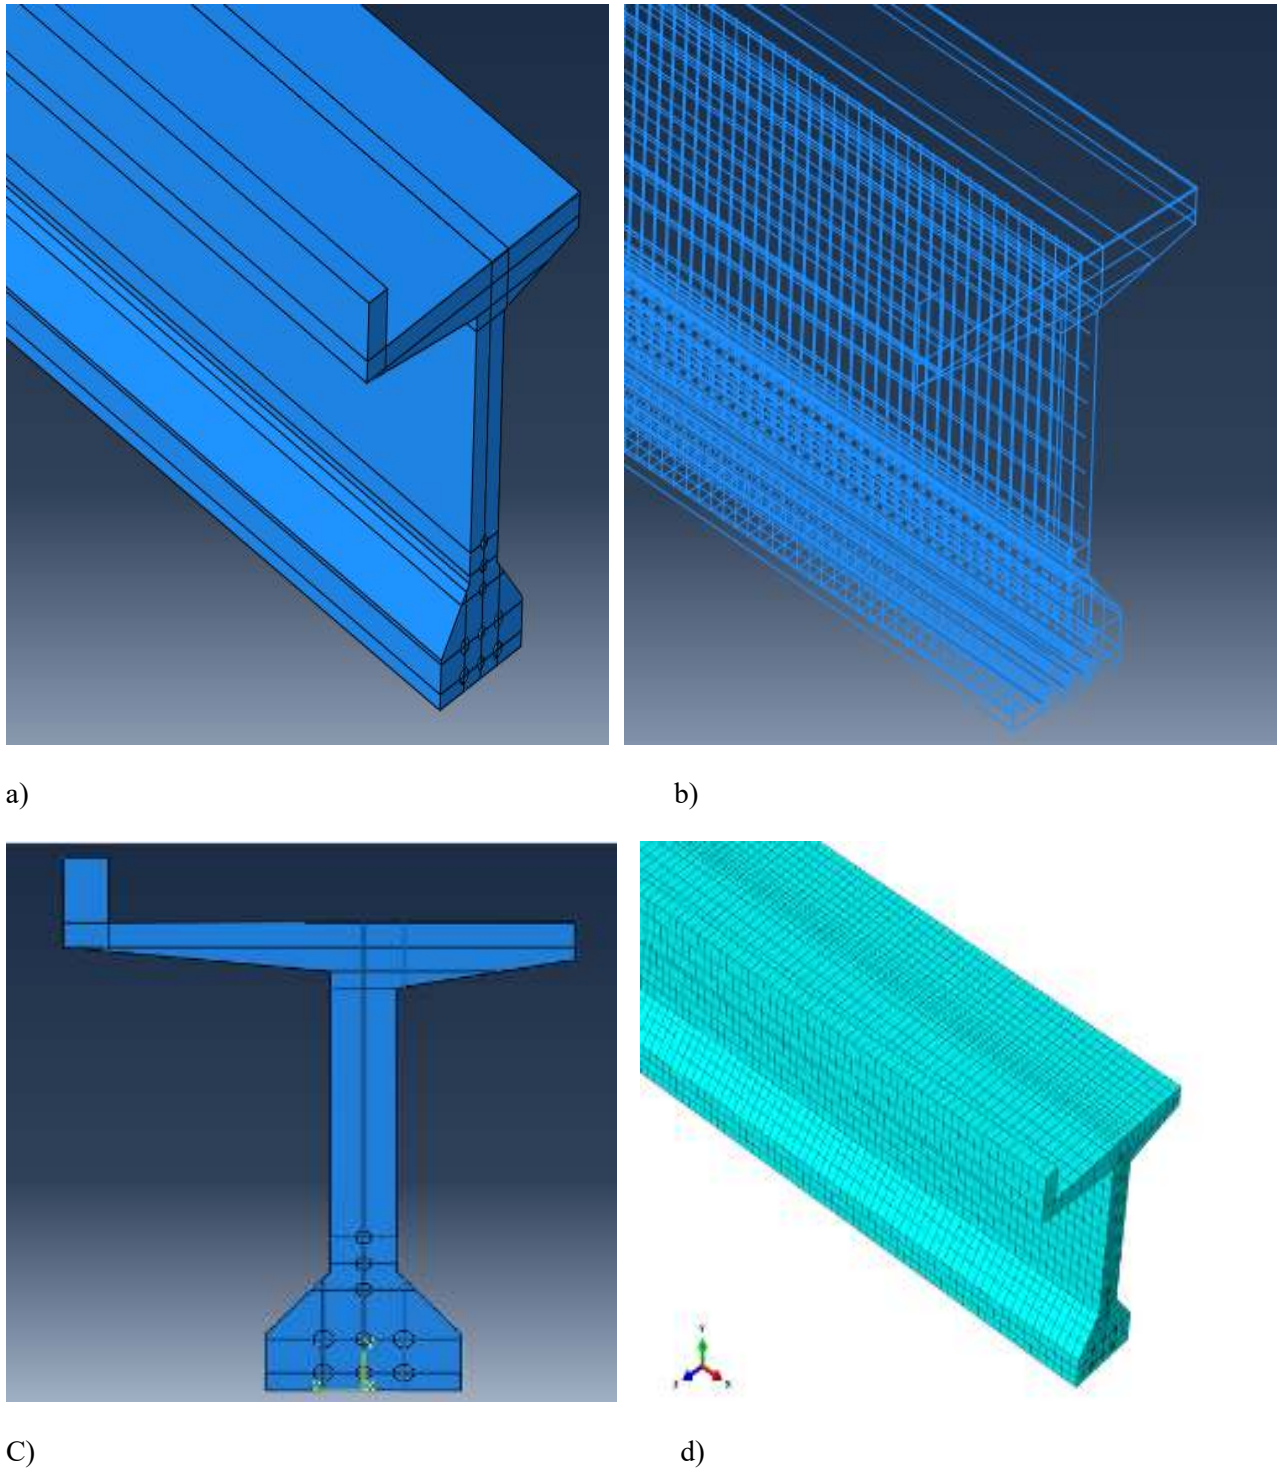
a) 3D solid, b) Reinforcement detail, c) Cross section and d) meshed model of prestressed T- girder
